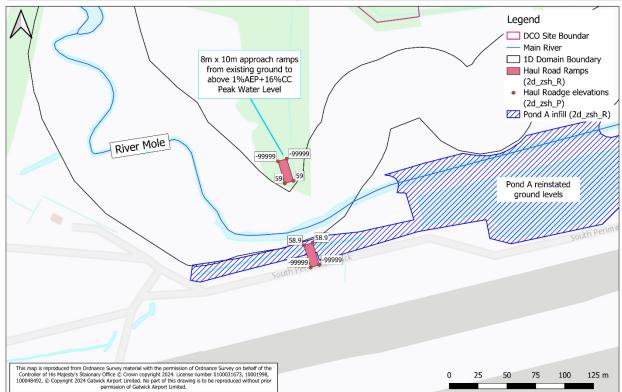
Temporary Haul Road Bridge over the River Mole setup in the 2D Domain.
